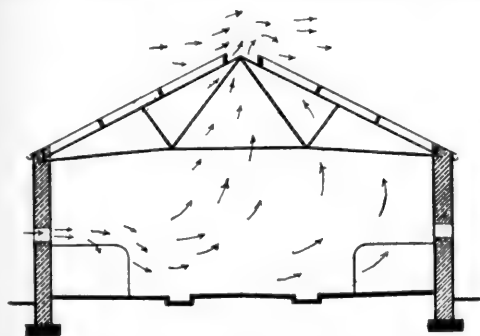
A Double Cow-shed with a permanently open ridge for the escape of foul air. The air inlets are drain pipes set at right angles to the wall just above the cows' heads.
